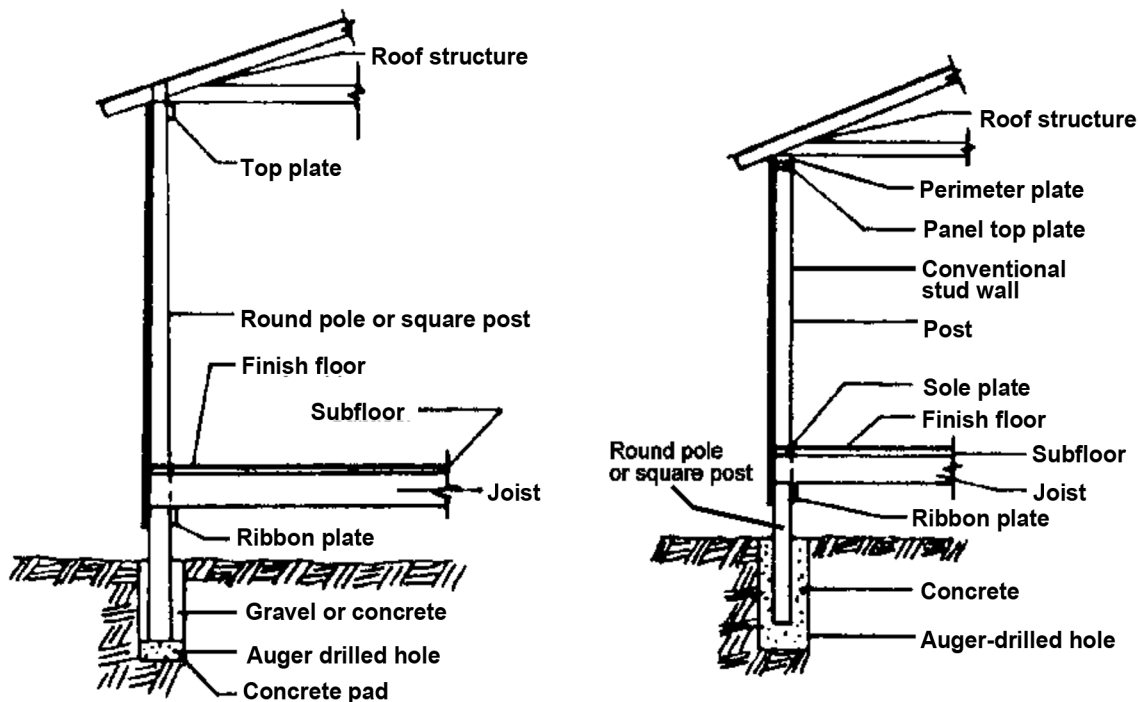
Pole and post-frame buildings: (left) pole or post forms both foundation and wall; (right) pole or post forms only the foundation for conventional platform-framed structure.
